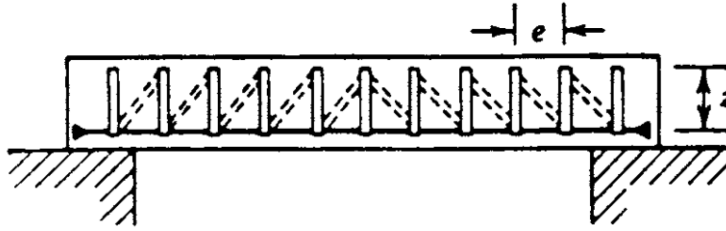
Example of beam using a traditional truss model (Ramirez & Breen, 1991).
